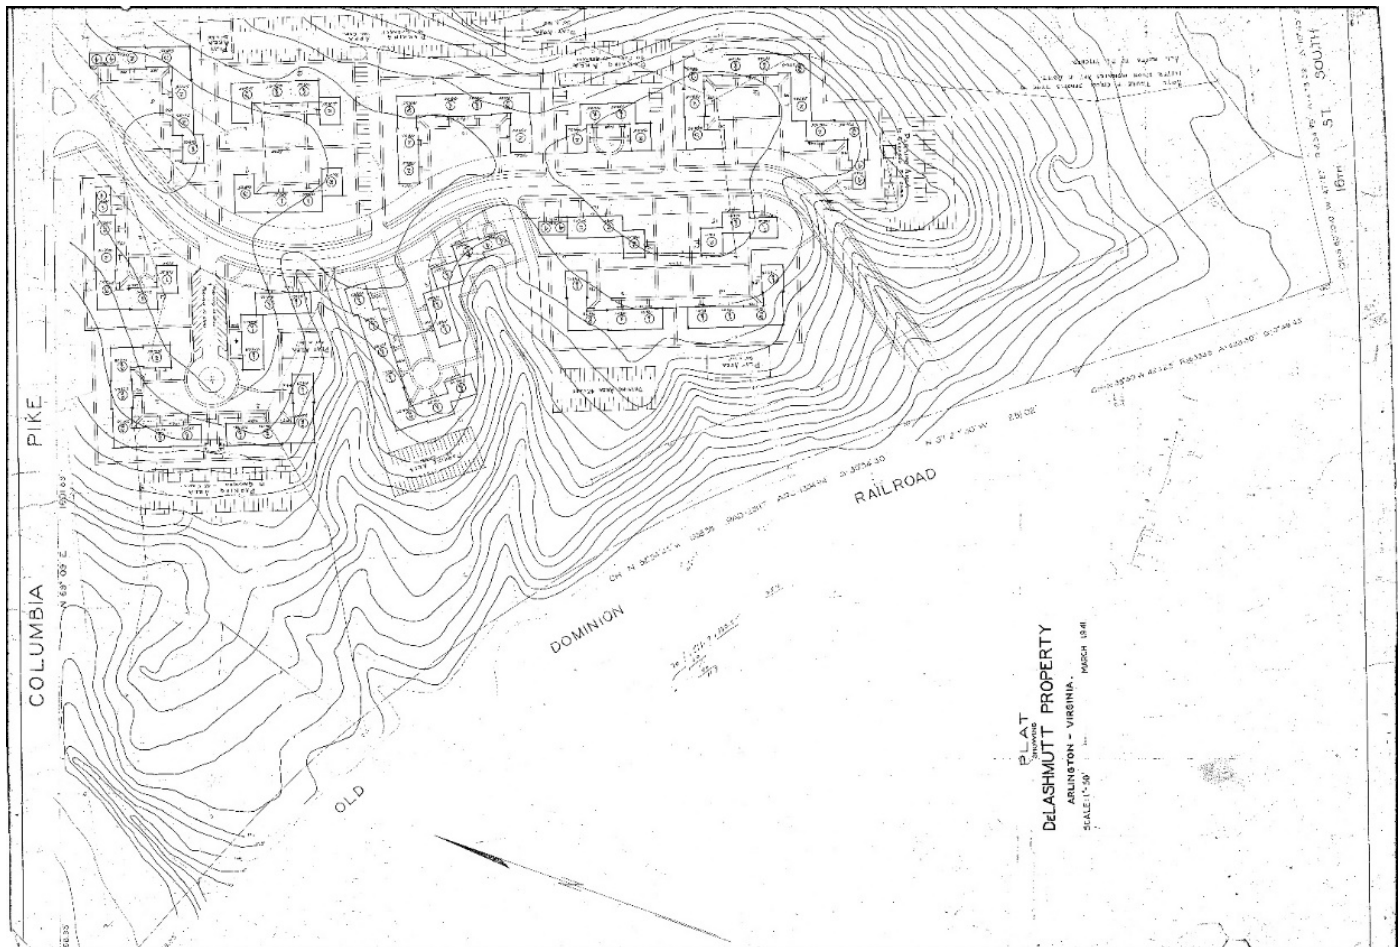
Barcroft Apartments, Section 1 Plat, March 1941 (Barcroft Apartments Archives)
